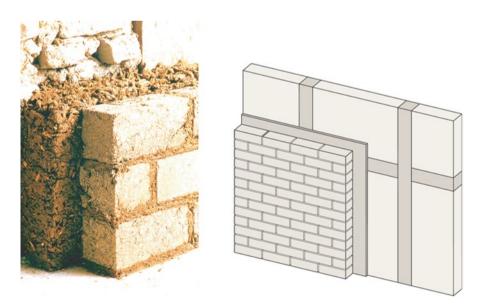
Thermal insulation of half-timber construction: wall lining made of light-clay blocks with leveling fill of wood-chip light clay [59, 60]
